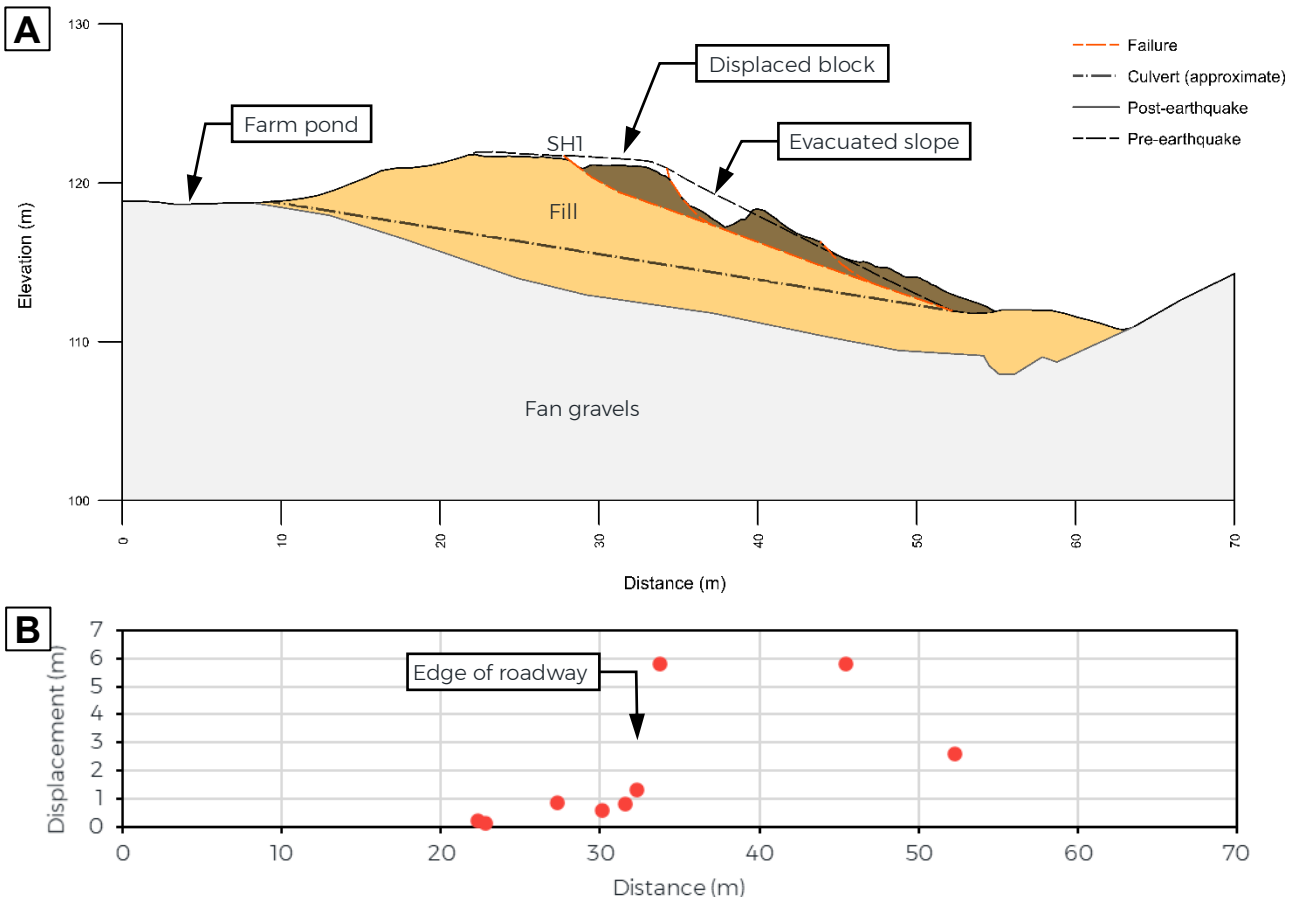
(A) Cross section and (B) displacement profile through the Culvert 55 embankment
